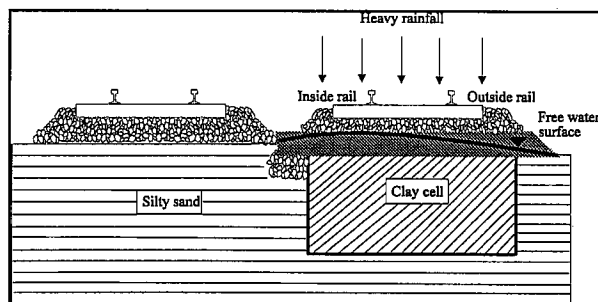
Cross Section of LTM Showing Subballast Free Water and Drainage Path
